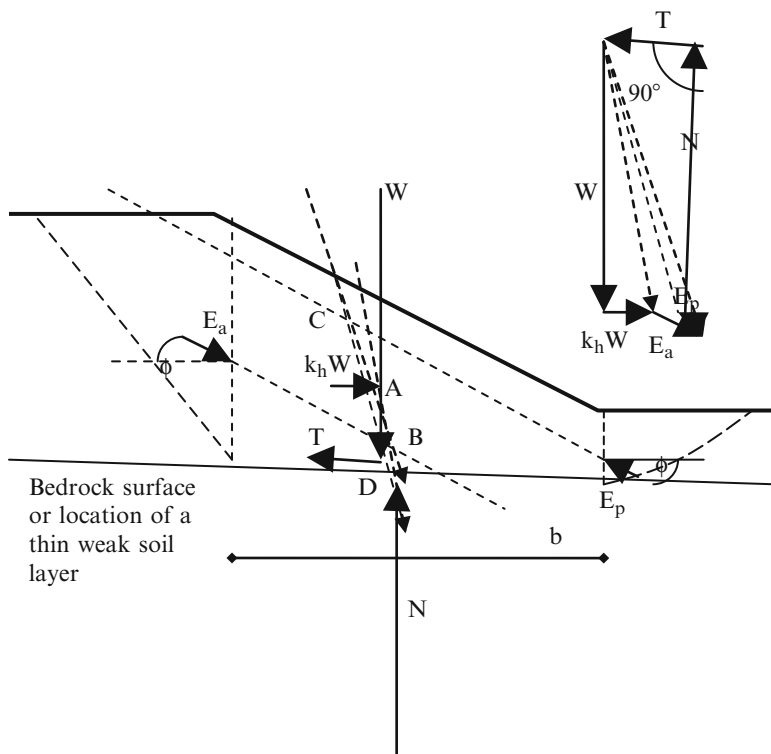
Cross section through a prismatic slip surface with the polygon of forces (arrows) acting on it
